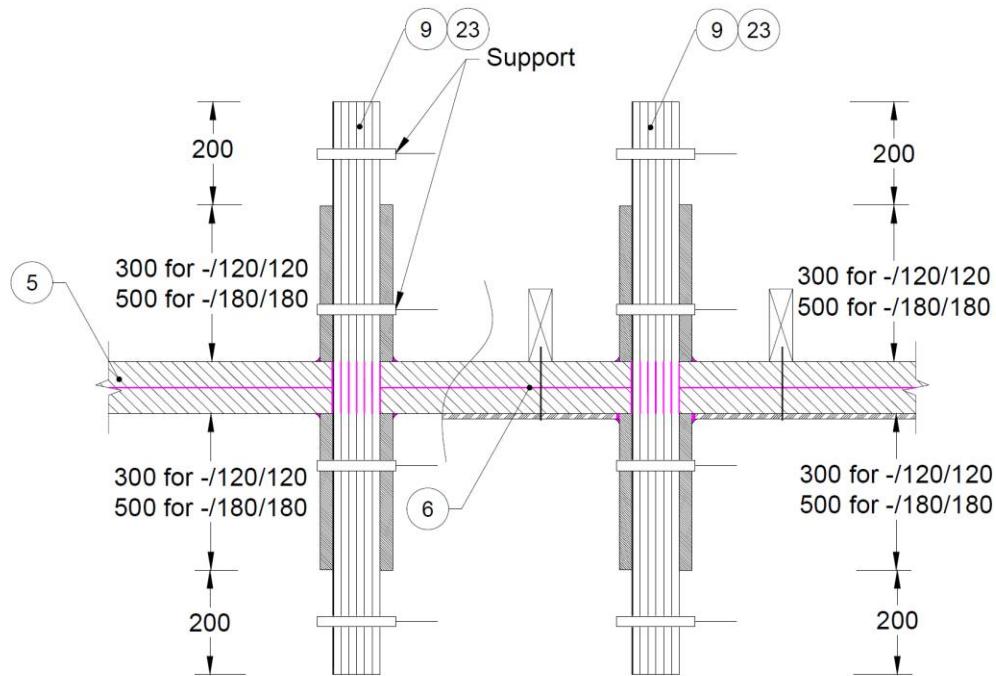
Section View of D1 and D2 Cables with/without Cable Trays in TBA Firefly™ Intubatt not against Wall Construction in Horizontal Substrates - Wrapping each side
